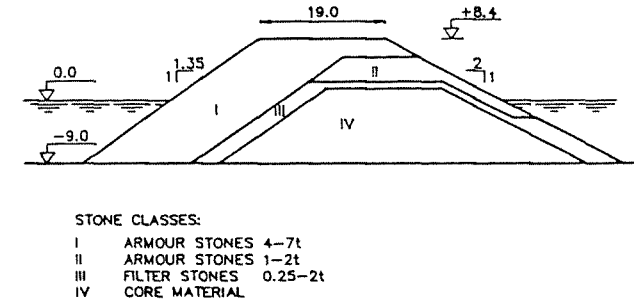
Typical cross-section for a berm breakwater at Hay Point. (Based on figure from Bremner et al (1987)). All measures are in metres.
